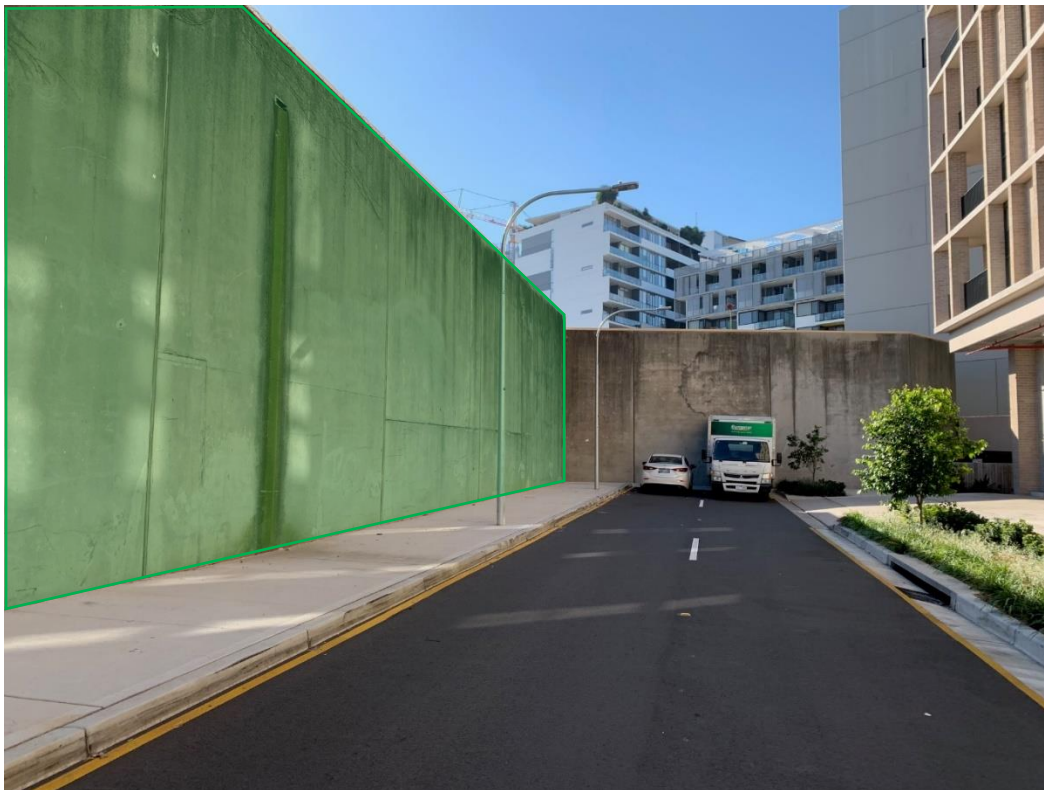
Subject site highlighted green and Kingsborough Way, with adjoining site at 888 Bourke Street located at the terminus of the carriageway.
